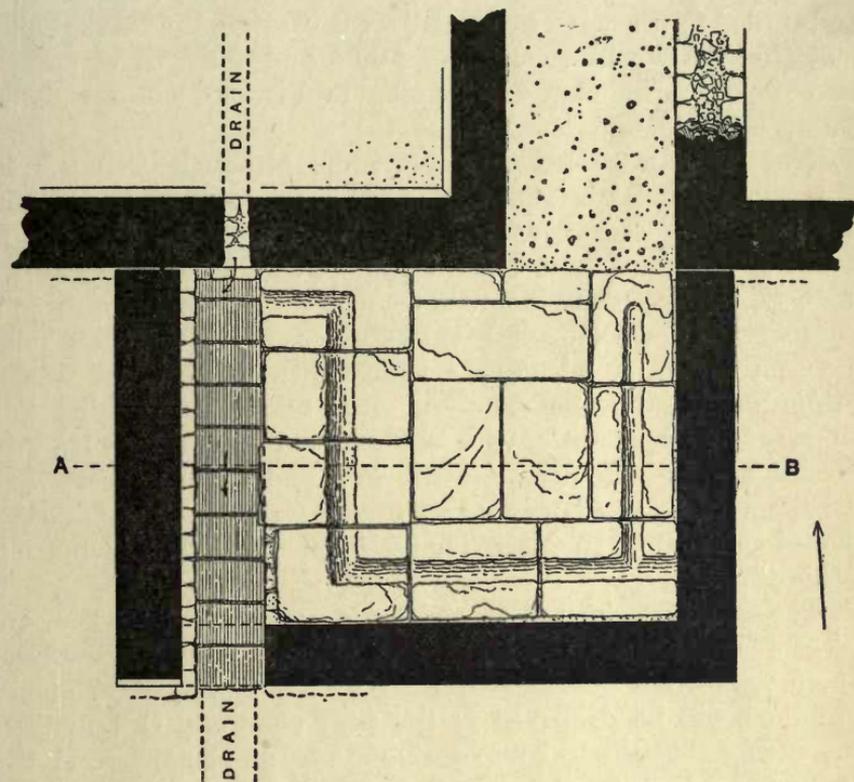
Plan and Section of Latrine, House 3, Caerwent. (6 ft. to 1 in.)
